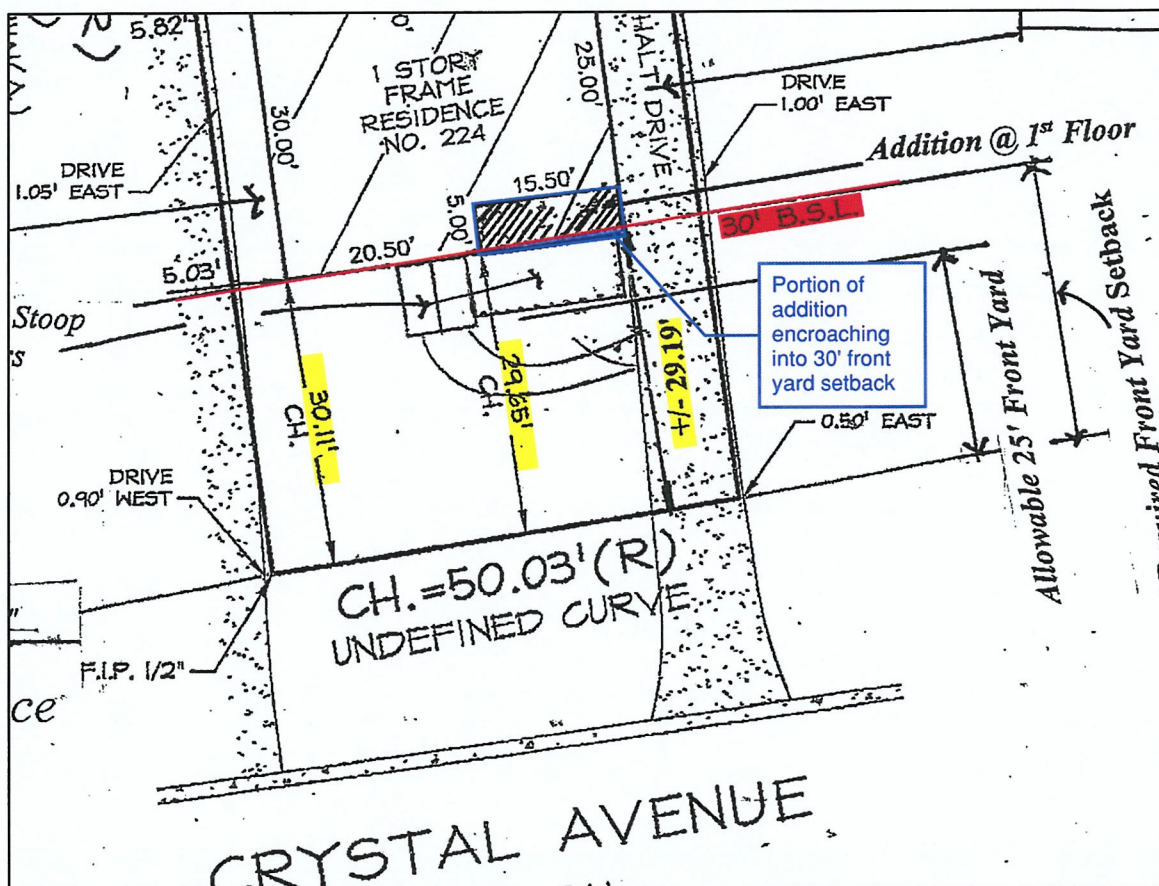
Proposed addition with existing and proposed front yard setbacks noted.
